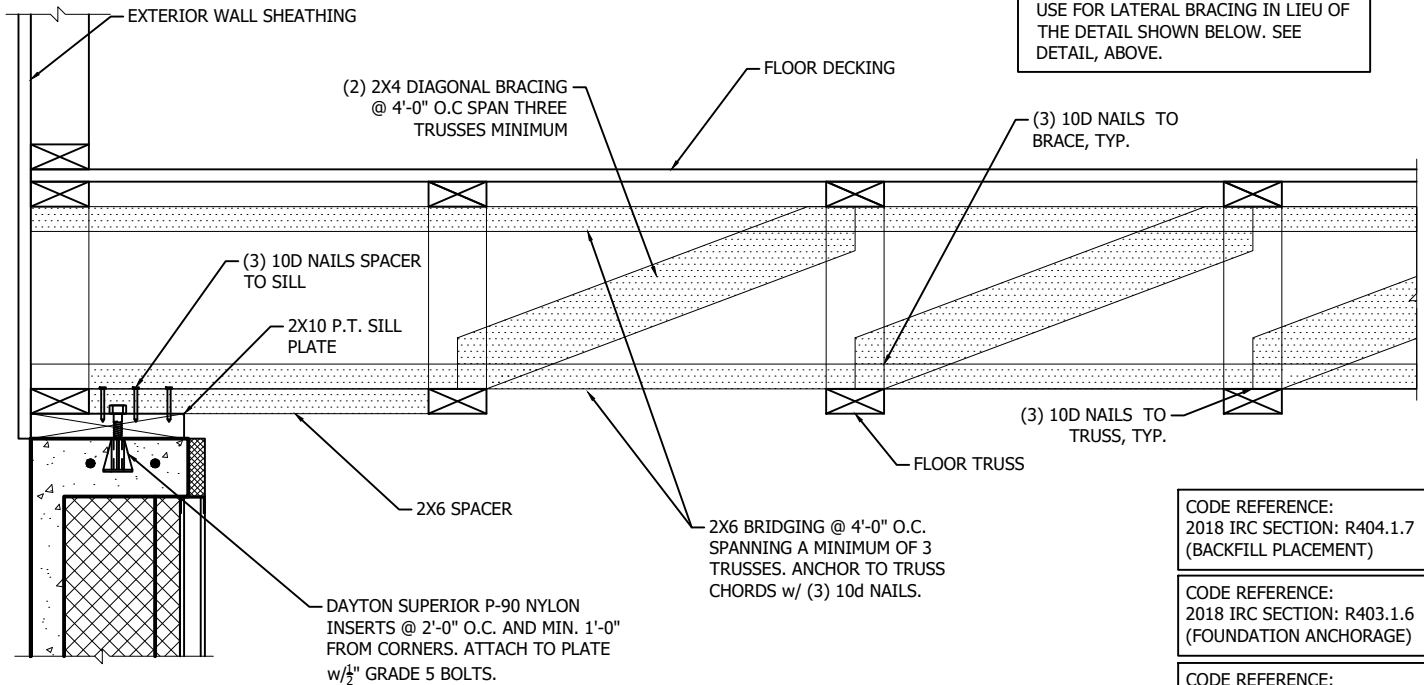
FLOOR TRUSS PARALLEL TO WALL
